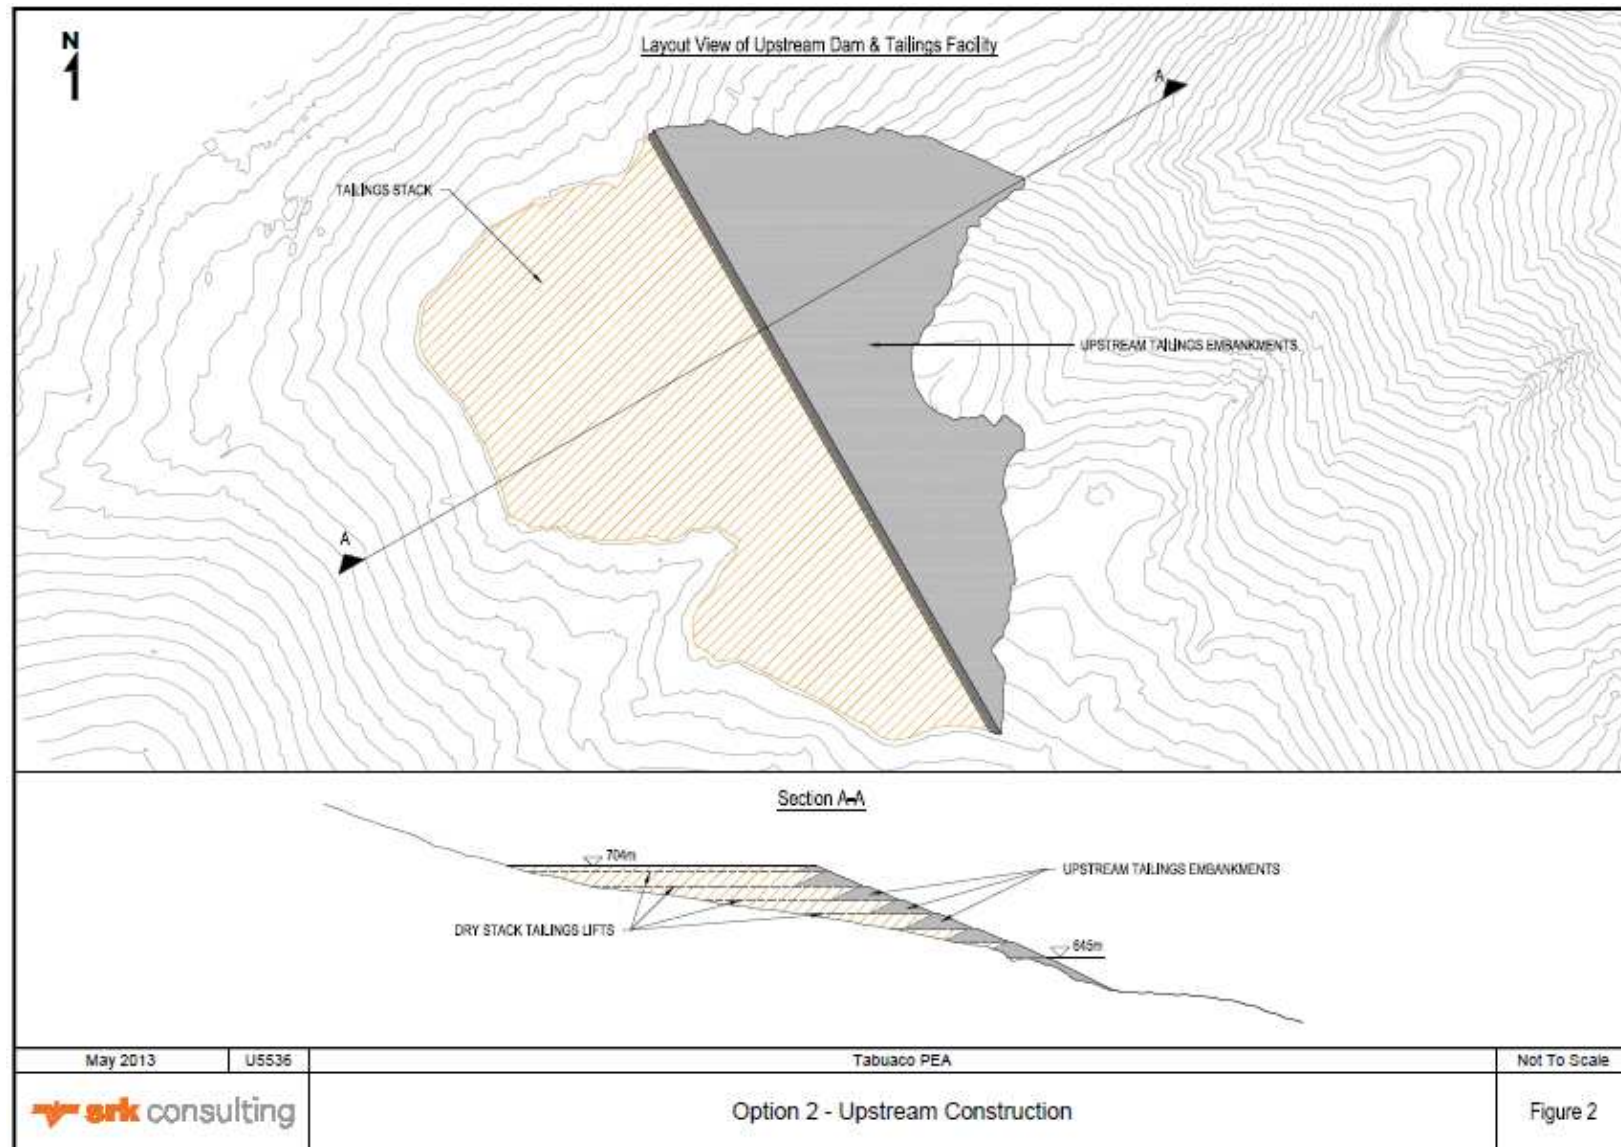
Dry Tailings Embankment Layout and Cross Section
